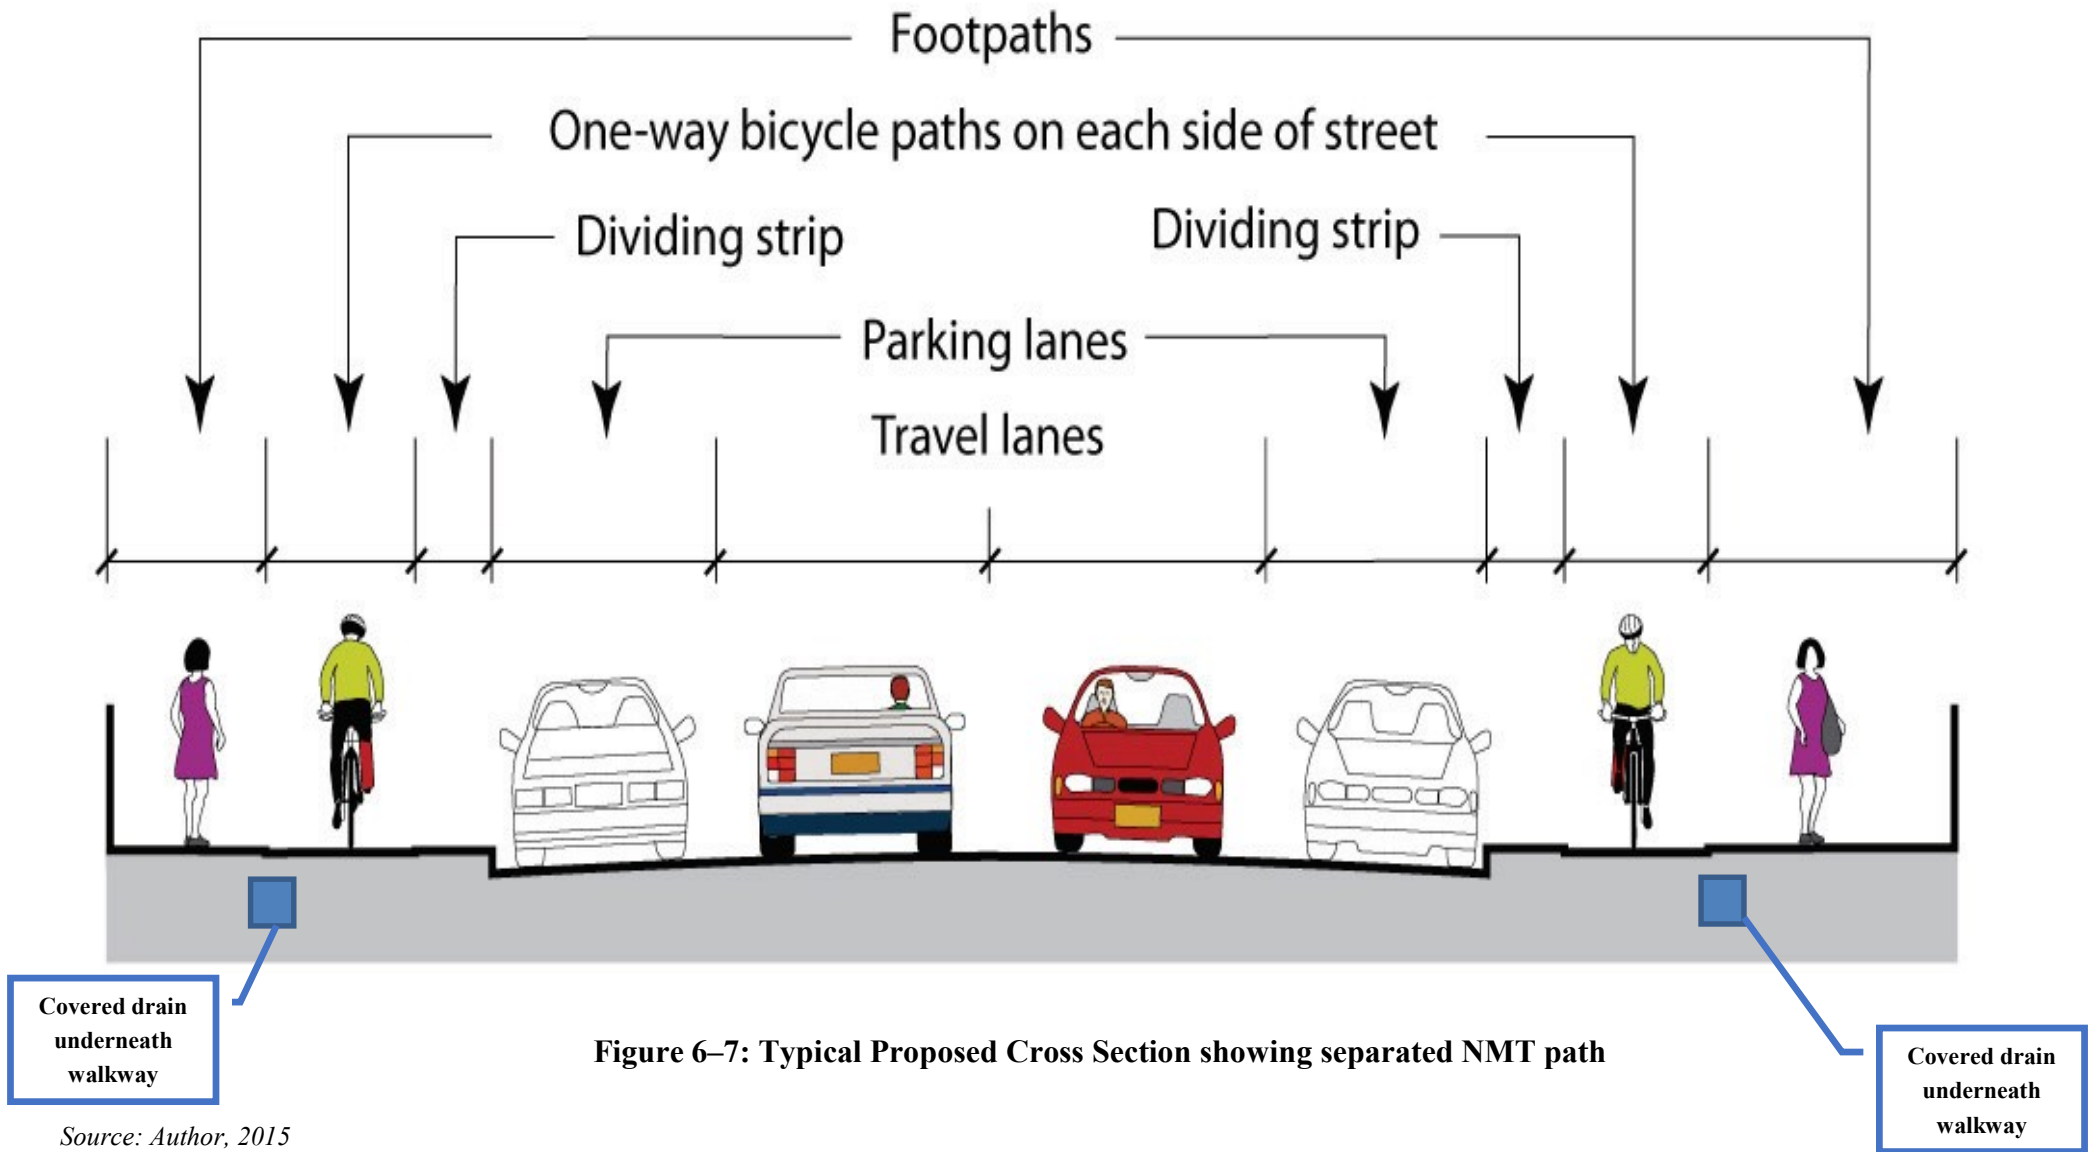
Typical Proposed Cross Section showing separated NMT path
